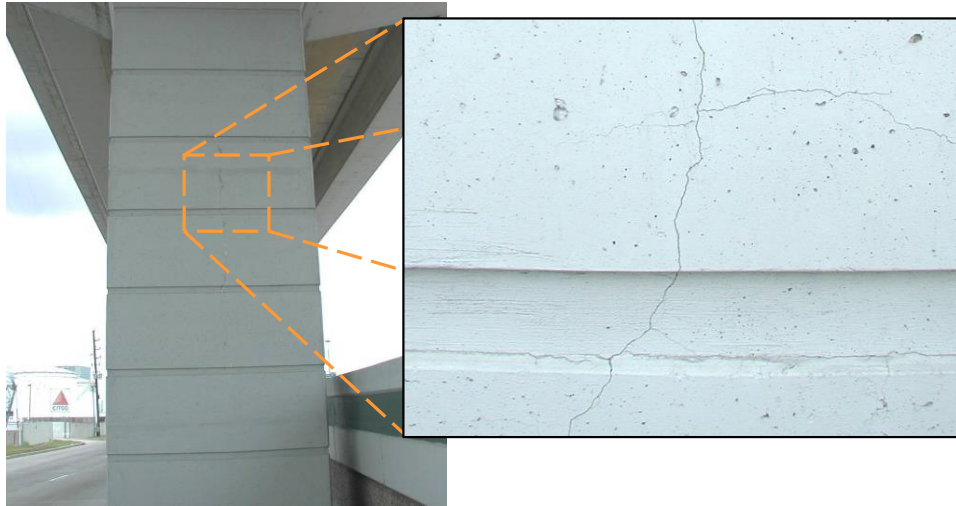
Thermal cracking of a bridge column in Texas (Photo courtesy of Dr. J.C. Liu)
